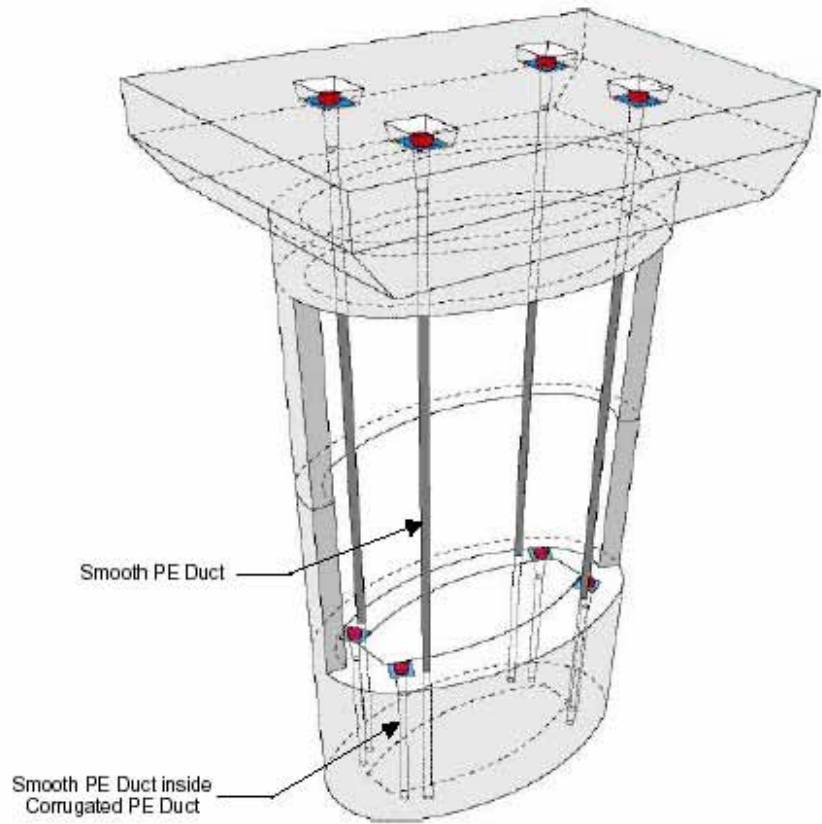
Vertical Post-Tensioning of the High-Level Approach Piers of the Sunshine Skyway Bridge, Florida¹⁶
